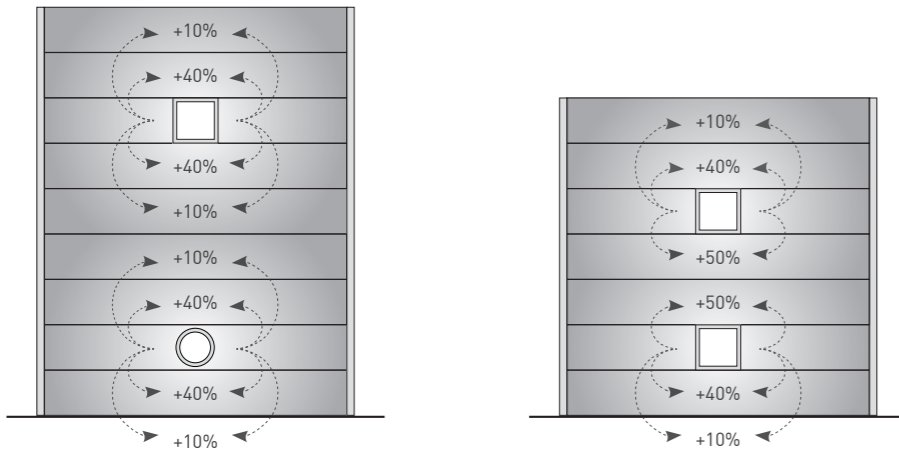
Load transfer of a weakened panel to adjacent panels
